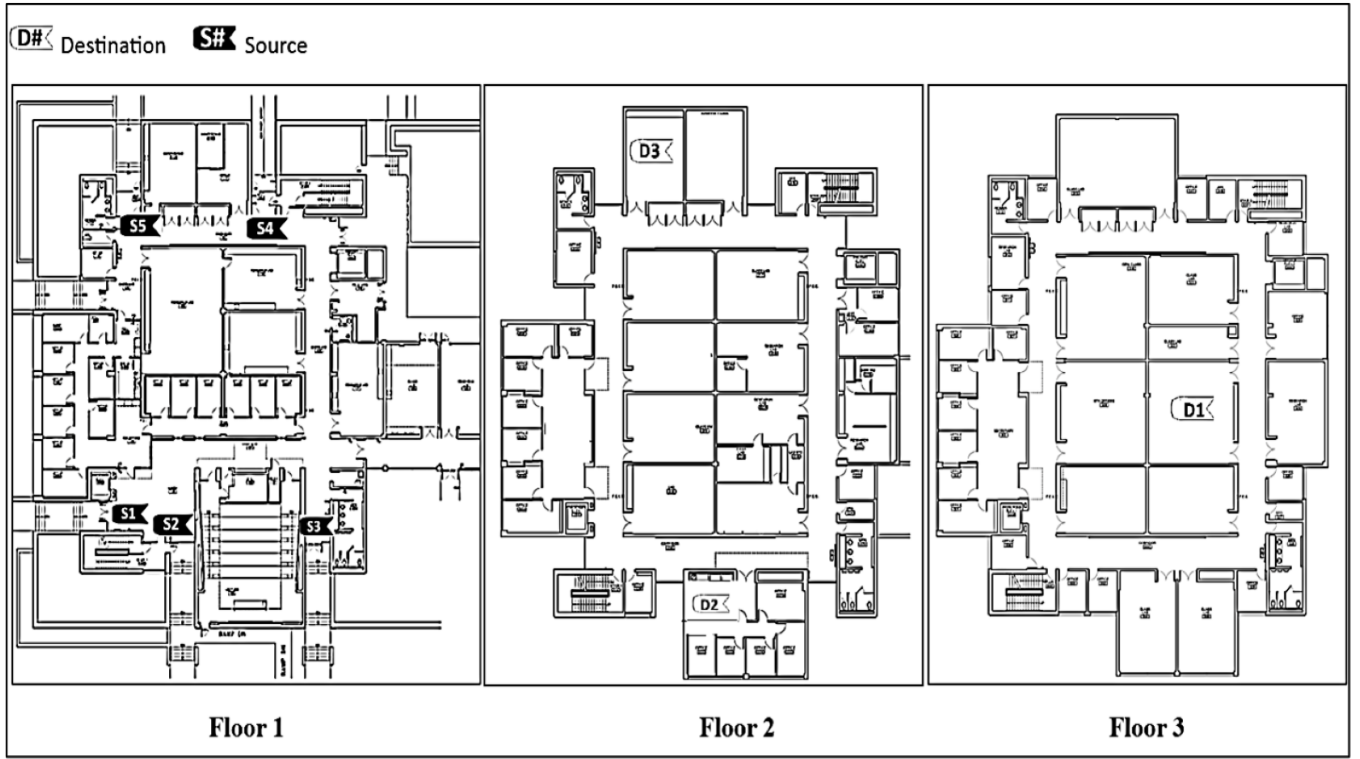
Wallace Hall Floor Plan with Source and Destination Labels
